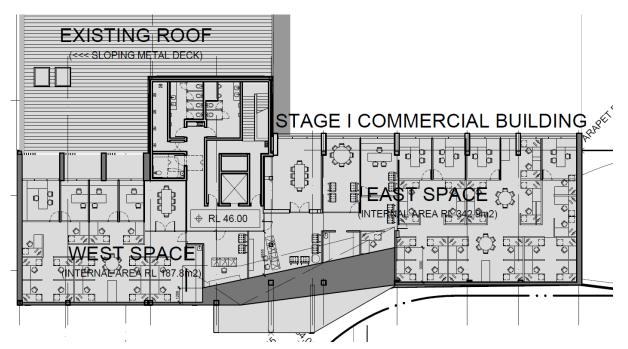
Extract from the applicant's Stage 1 Level 2 plan demonstrating the detailed design of the proposed addition of a commercial tenancy above the existing building. The walls which are directed towards existing adjacent and proposed residential apartments are designed to protect the visual and acoustic privacy of the surrounding apartments by providing blank walls and privacy walls/screens (at the north-western section of the commercial tenancy).
